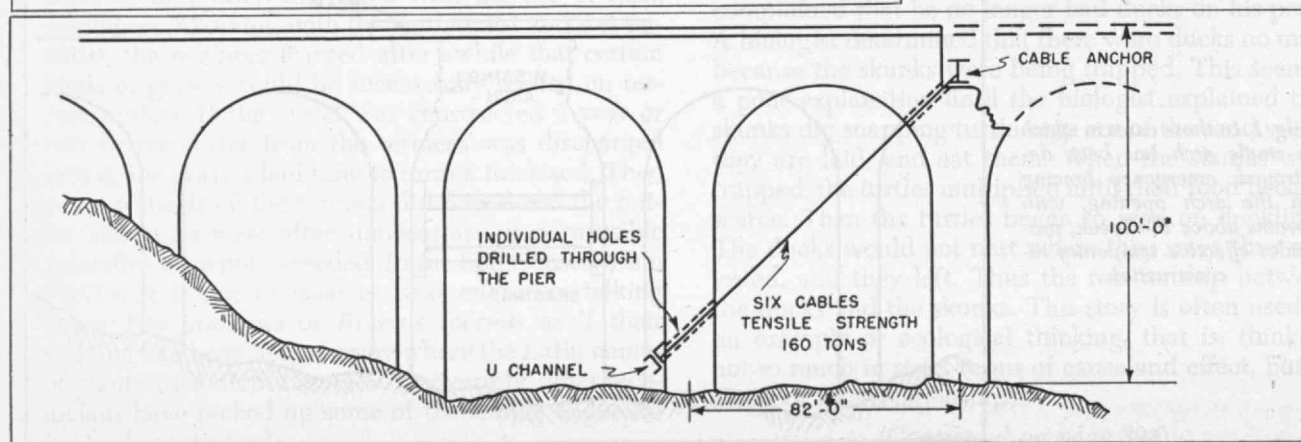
Sketch (below) of the "tie-back" arrangement at the west end of the Kaempfelbach viaduct. The unbalanced side thrust of the last pier, which has not been destroyed, is anchored by the six cables connecting the cable anchor with the U-channel.
